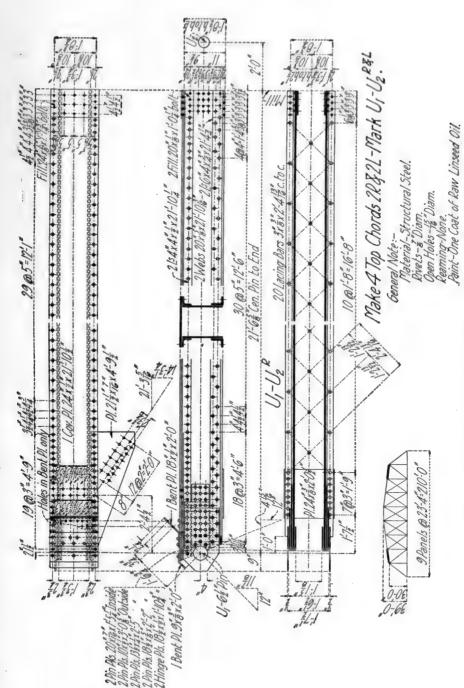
Shop Details of Top Chord of a Truss Bridge.
